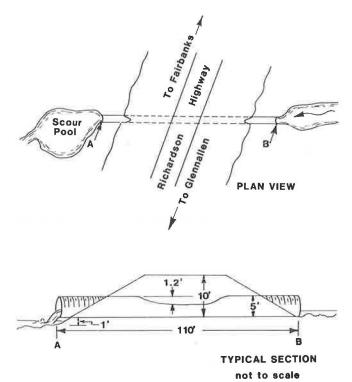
Plan view and typical section Poplar Grove Creek.
